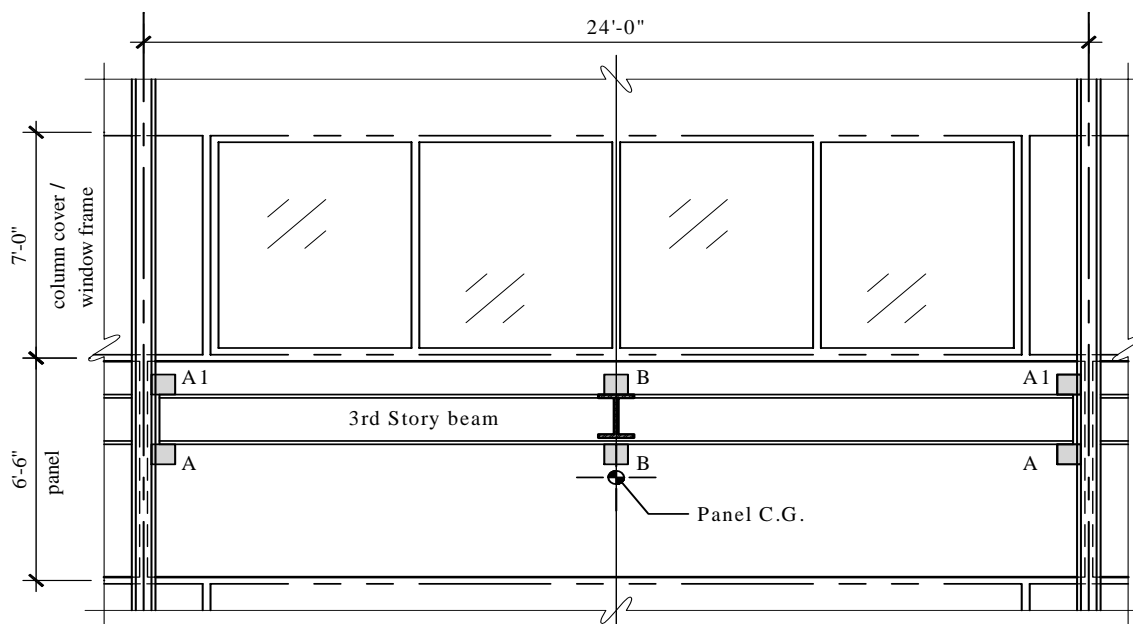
Spandrel panel connection layout from interior (1.0 ft = 0.3048 m).
